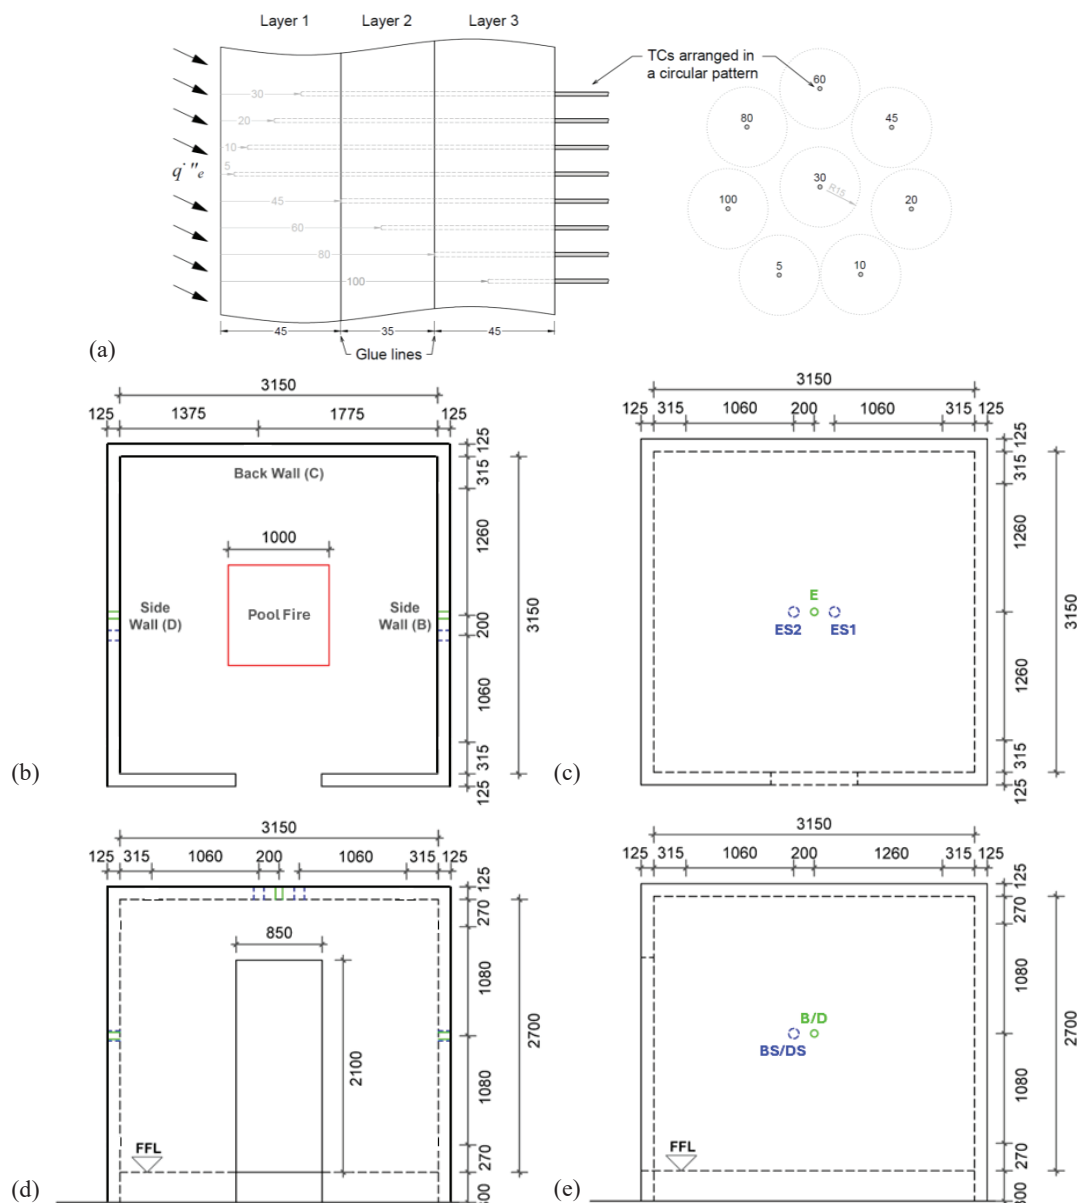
(a) arrangement of TC clusters inserted from the back, (b) plan view of compartment layout, (c) plan view of ceiling E, (d) front view, and (e) elevation of compartment side walls B/D, with TC clusters (green/solid) and instrumented cylinders (blue/dashed) indicated.
